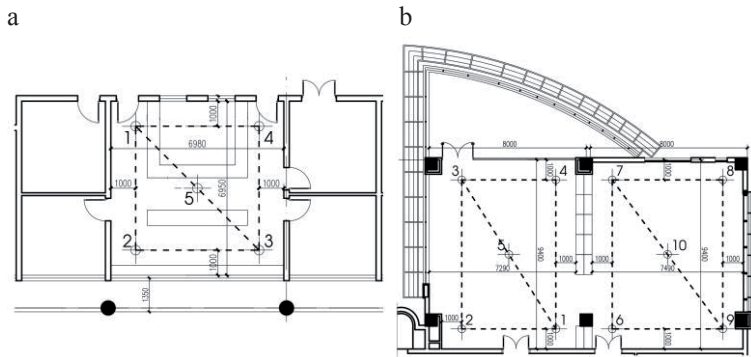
Location of measuring points in: a – room 205 of A1-NUCE building; b – room of 5th floor of EVNCPC building
